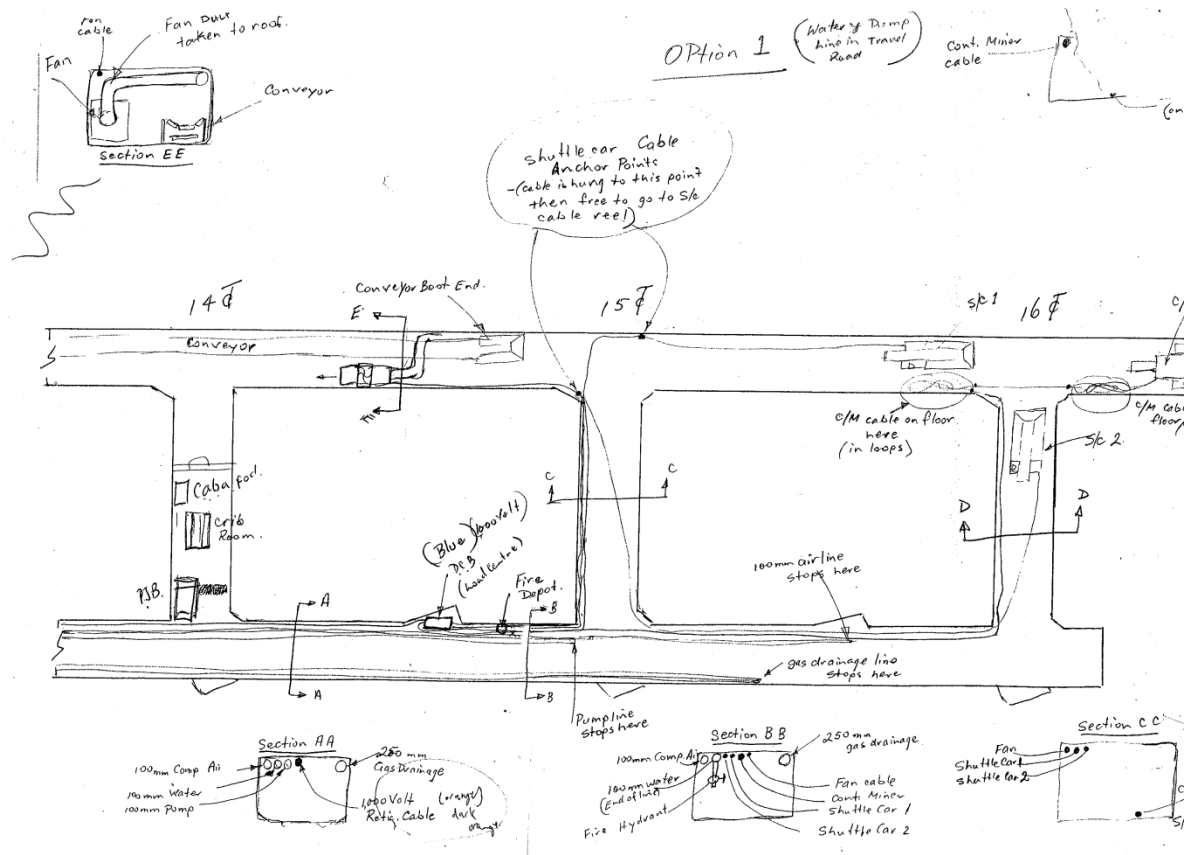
Example section of complete mine plan showing locations of infrastructure.
